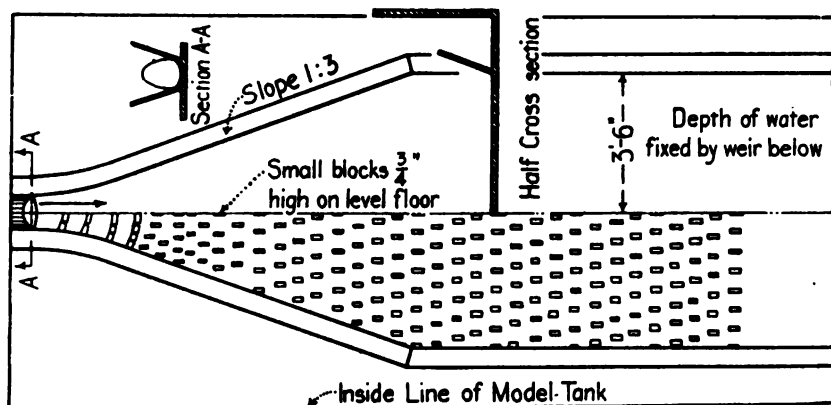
PLAN OF FIRST MODEL OF OUTLET STRUCTURE FOR GERMANTOWN DAM.
